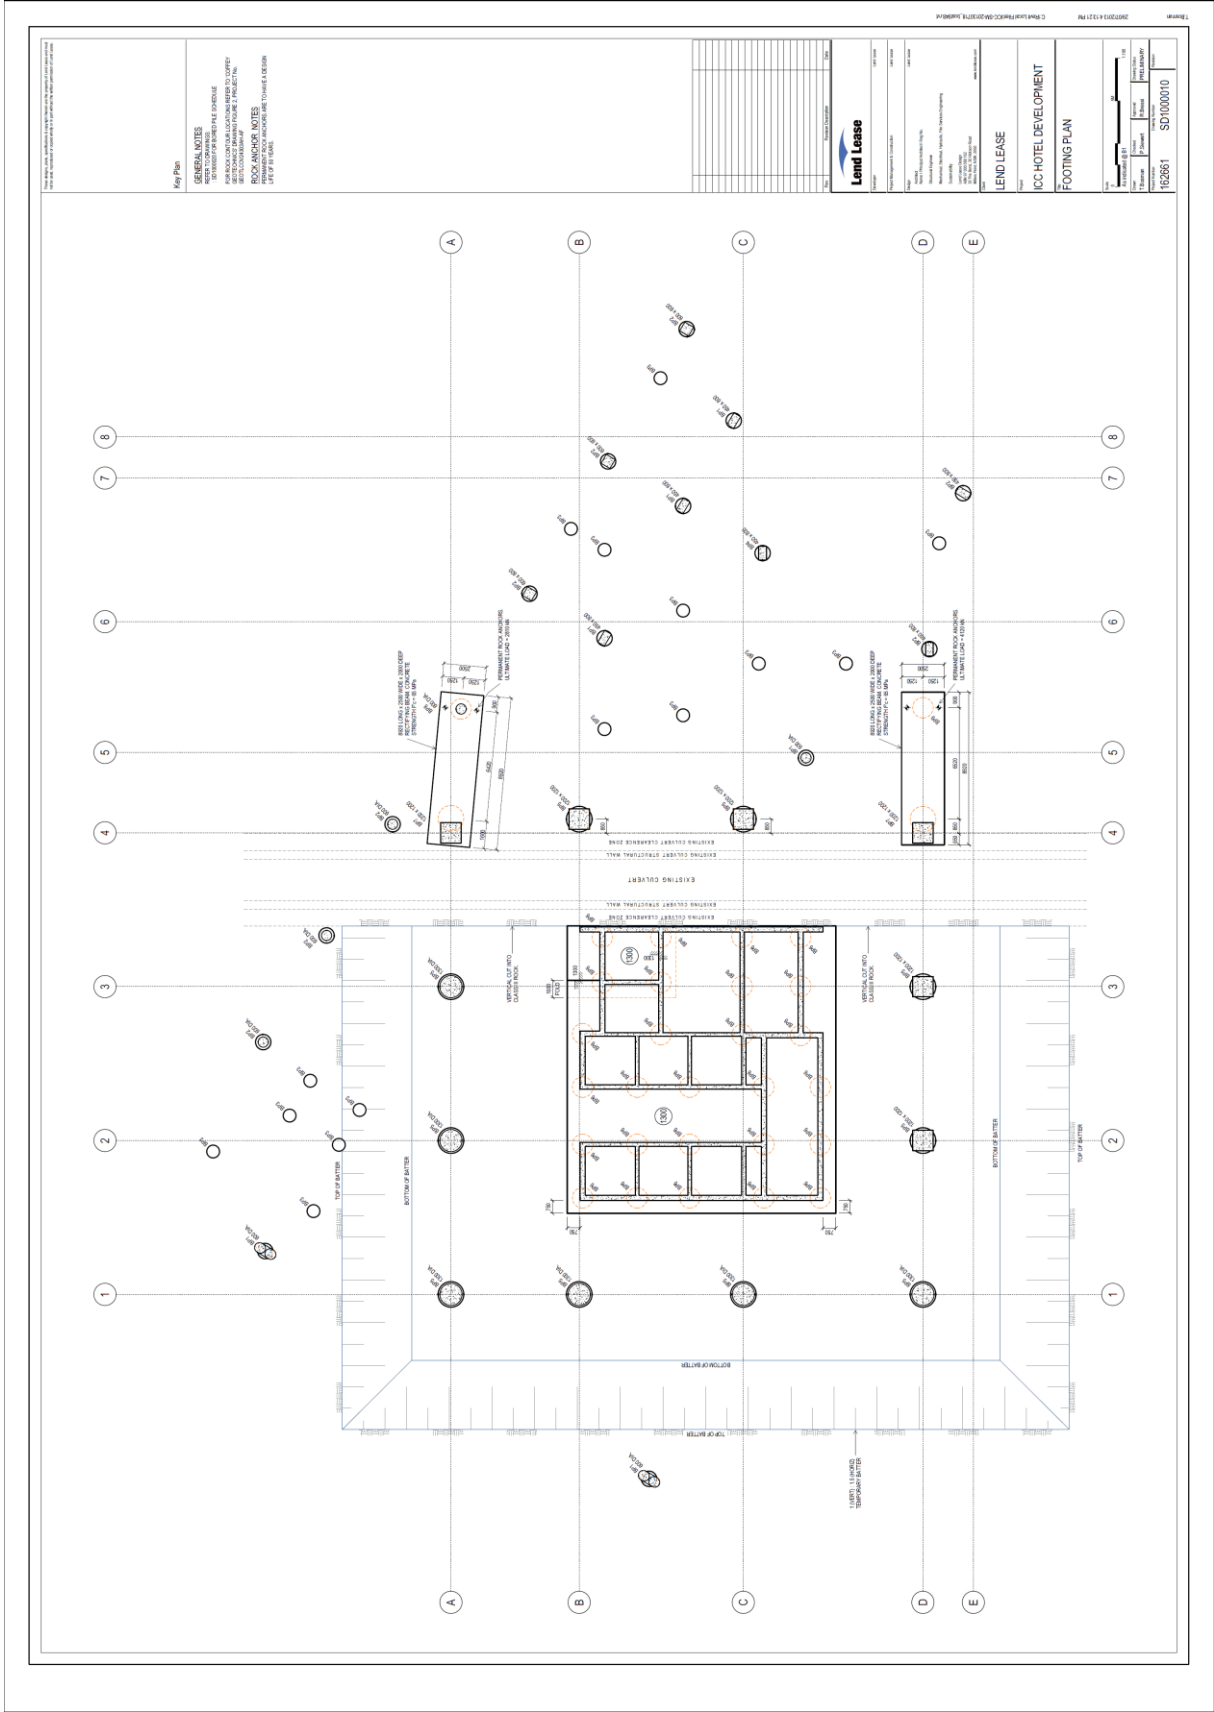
Footing plan, ICC Hotel. Note areas of bulk excavation and associated batter. Lend Lease, 29/07/2013.
